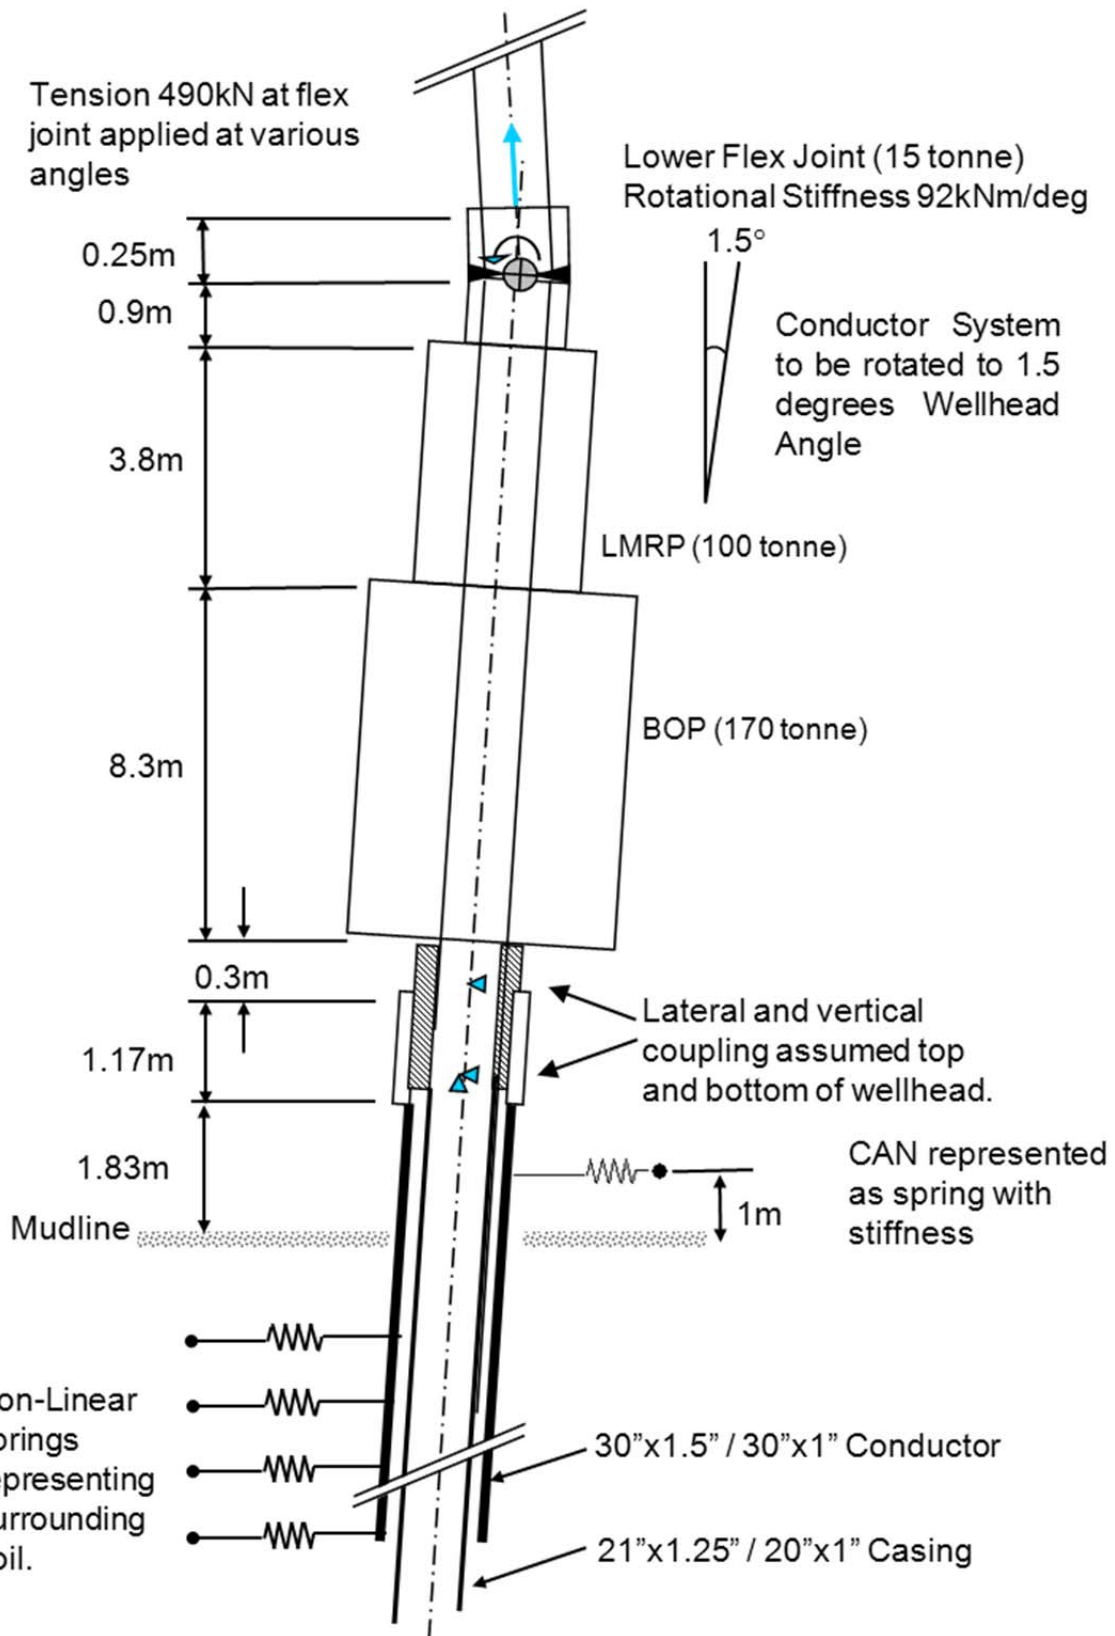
Load Case 2: Illustration of Wellhead, Conductor and Sub-Sea Equipment Stack-Up supported in a CAN Foundation
